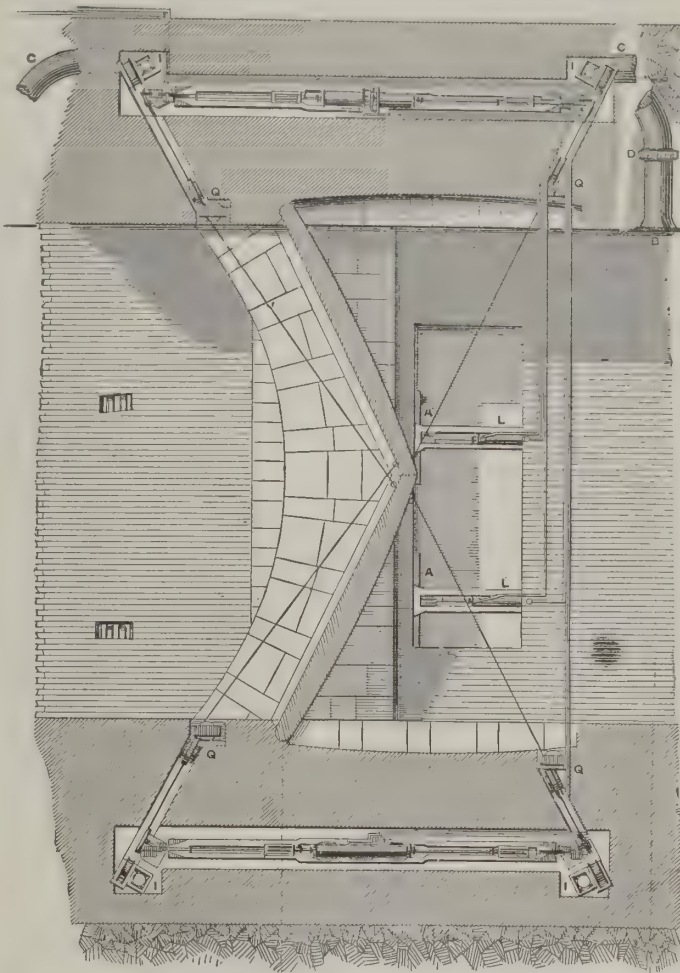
PLAN OF UPPER LOCK GATE SHOWING OPERATING MACHINERY.
